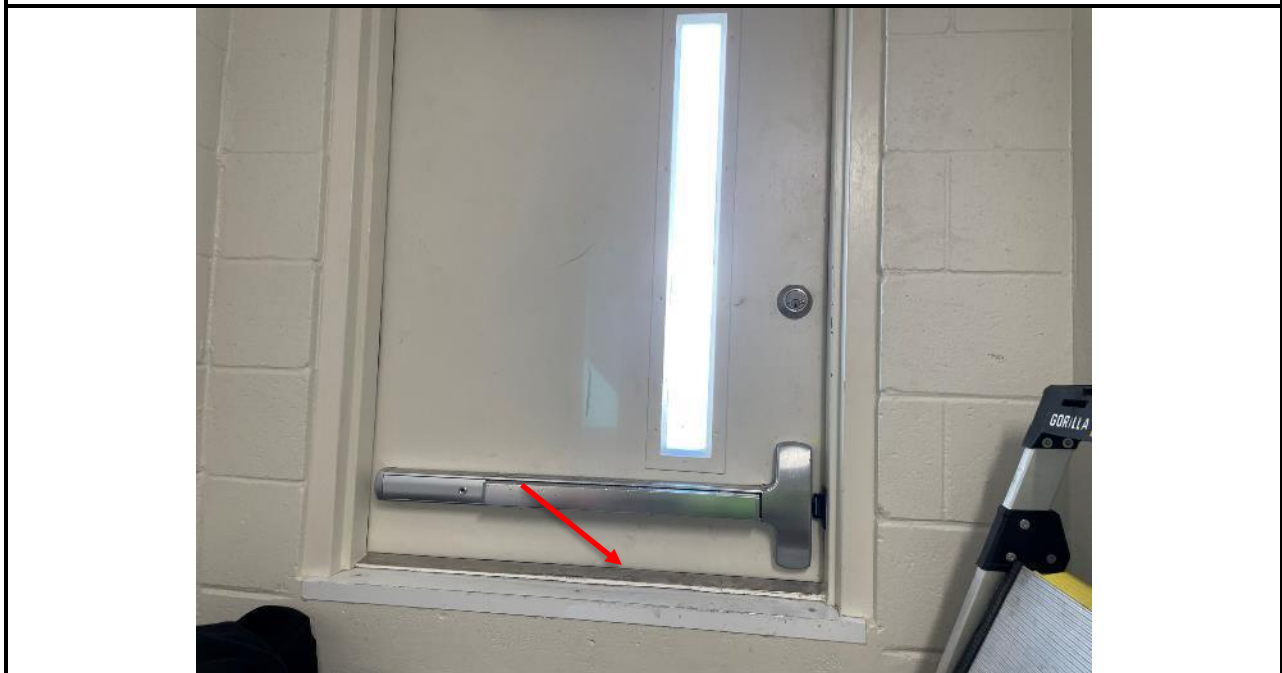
Test location #3 - water was visually observed ponding on the internal threshold of the access door and cascading down the interior face of the gypsum wallboard eventually collecting on the finished flooring within minutes of commencing testing.
